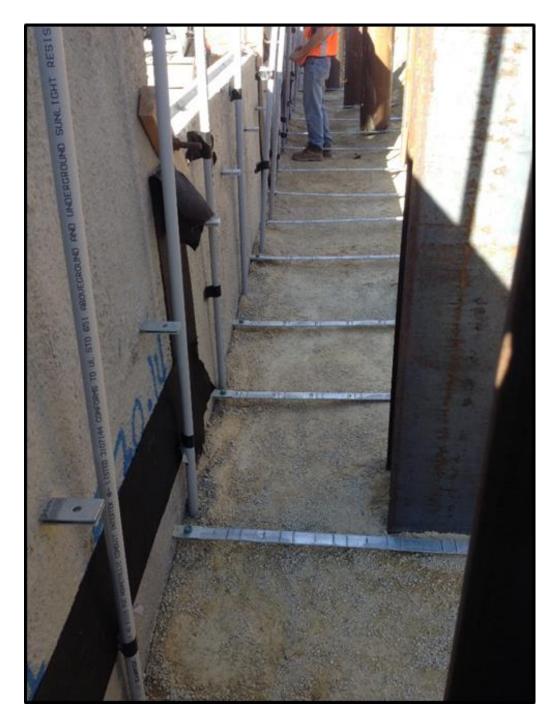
RECO steel ribbed strip soil reinforcing set up.
